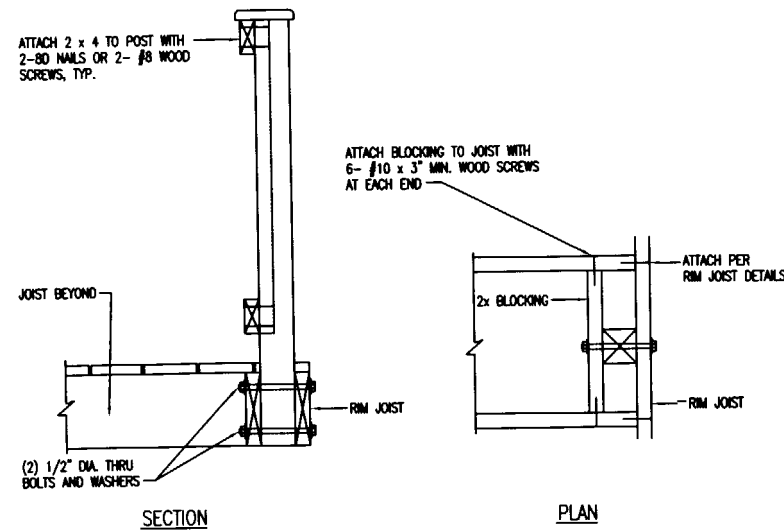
GUARD POST TO RIM JOIST DETAIL - OPTION 1
